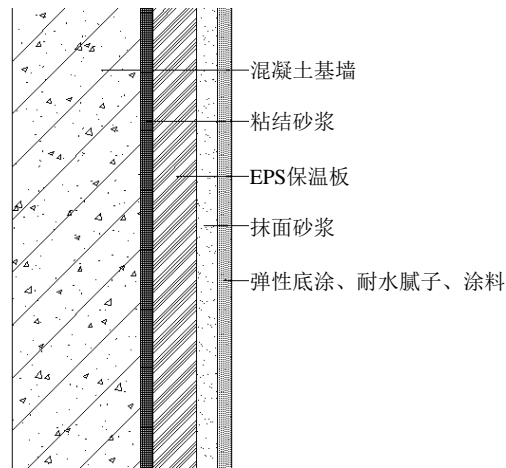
Structure of the wall composed with external thermal insulation system with EPS board
